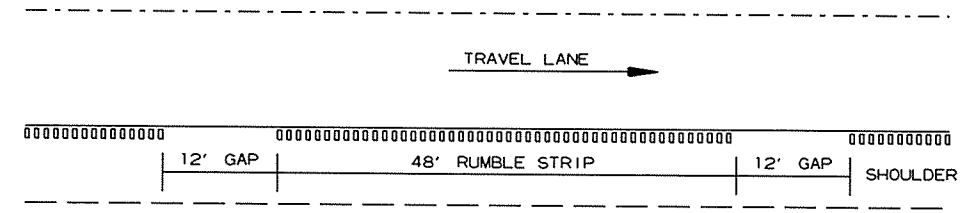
DETAIL FOR RUMBLE STRIP GAP AT DRIVEWAY TURNOUTS
